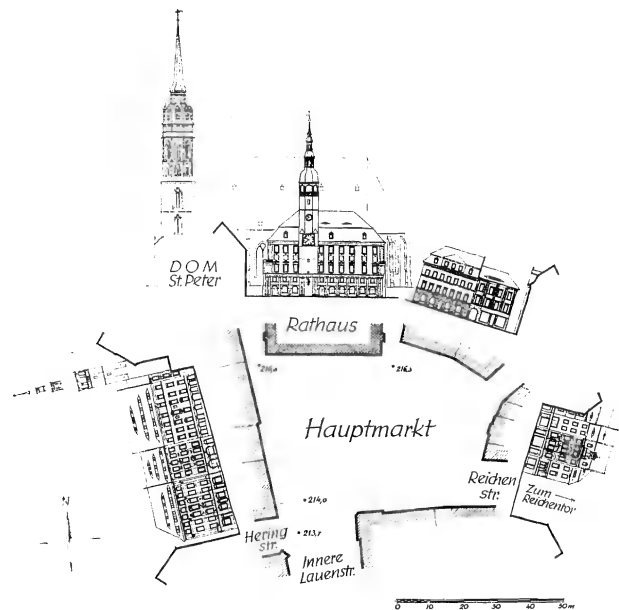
6. Plan of "Hauptmarkt" in Bautzen. (After Rauda:)
